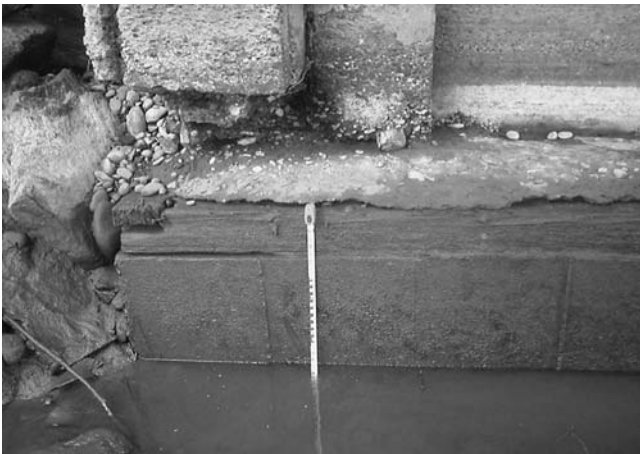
Inspection photograph of exposed pier spread footing on the Kline Bridge on Highway 99 over Salmon Creek.
